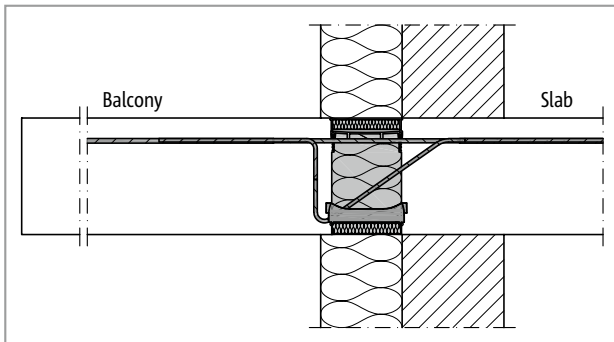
Schöck Isokorb® XT type K: Connection with thermal insulation composite system (TICS)
